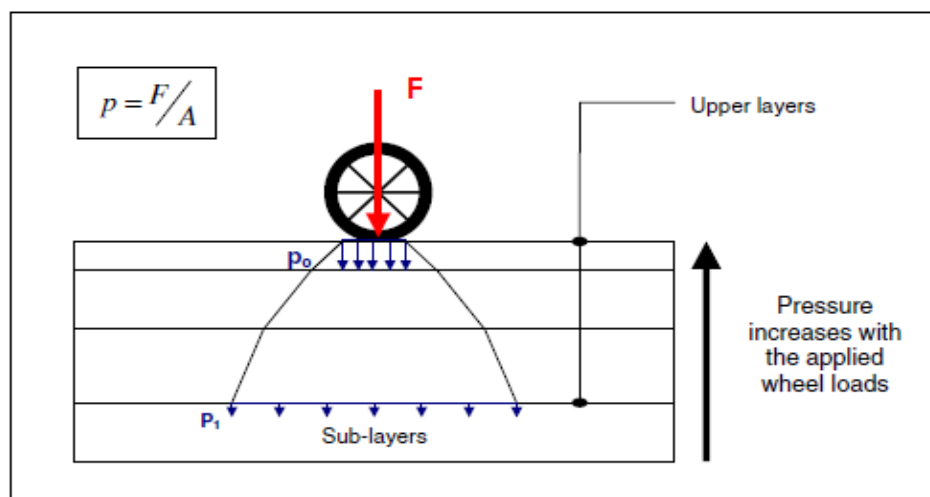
Load transfer through pavement layers (Wirtgen, 2002)
